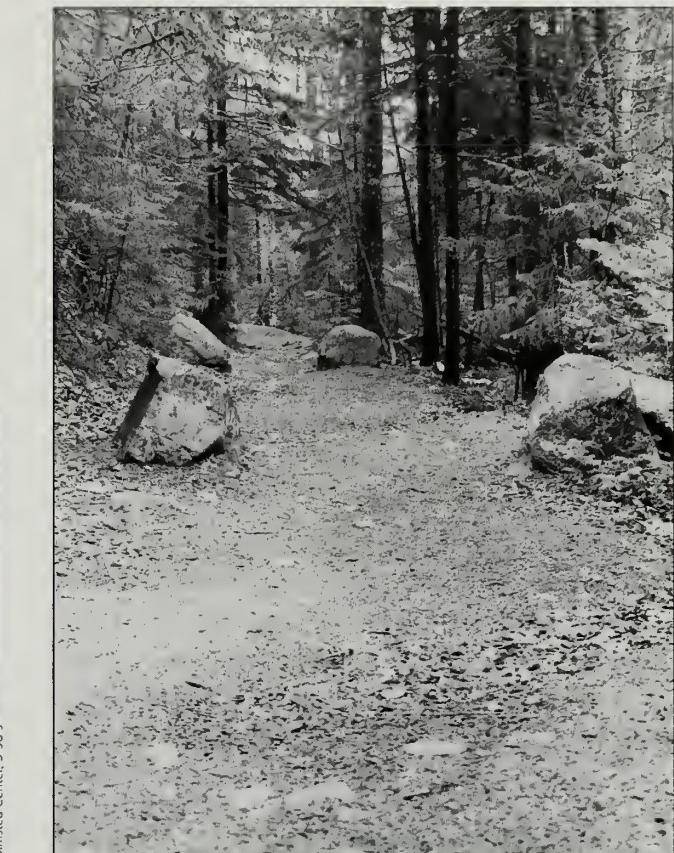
Large coping stones marking a section of the Beech Mountain Loop Trail (#113).
